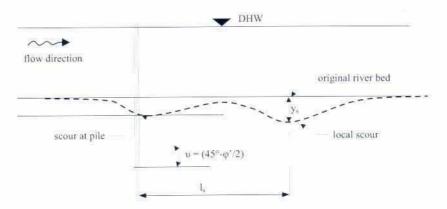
Design scour profile - without scour protection on river bed
